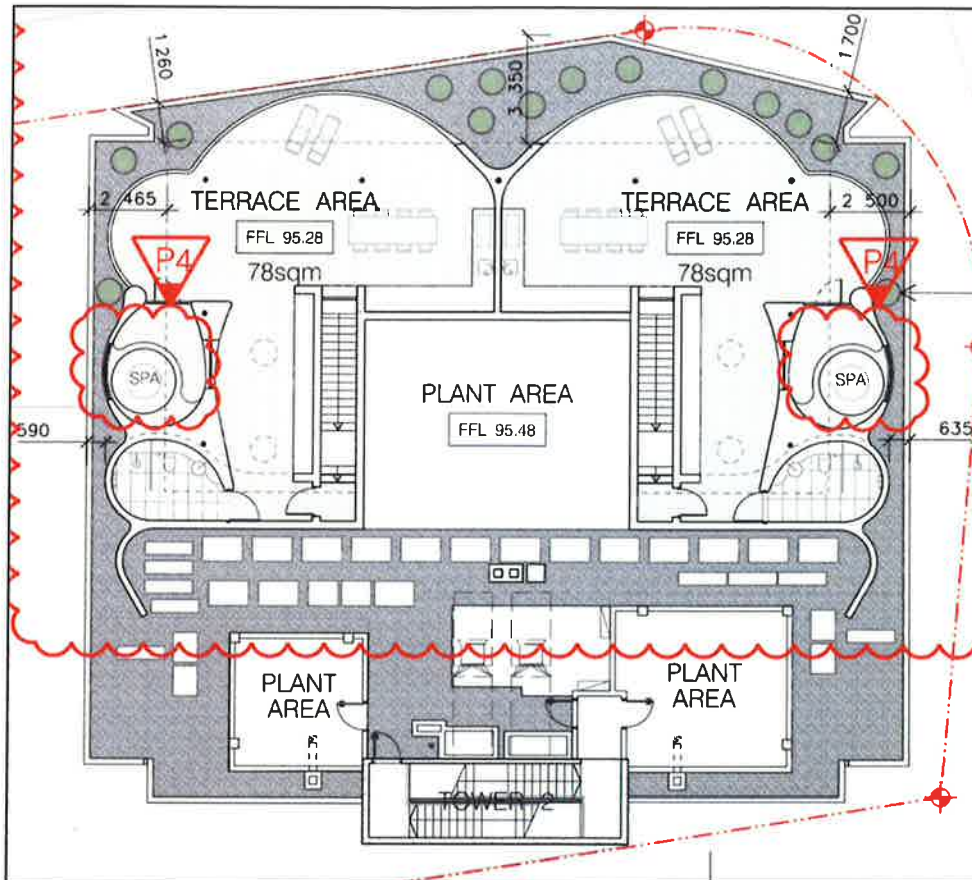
Proposed layout of roof terraces (Source: Amended MOD 5 architectural plans)
